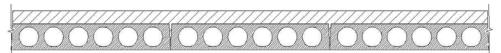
F(2) - PRECAST "DELTACORE" PRESTRESSED CONCRETE SLAB WITH IN SITU TOPPING
